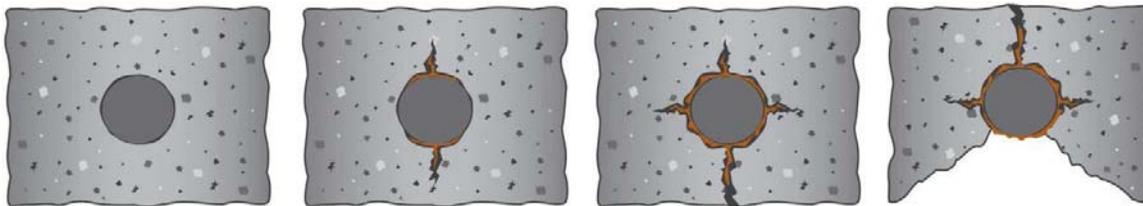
Development of corrosion of a reinforcement bar in concrete.
